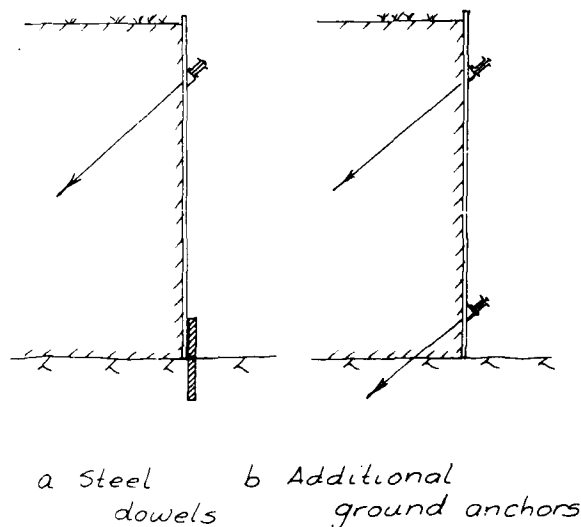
Prevention of toe failure for anchored sheet pile walls
